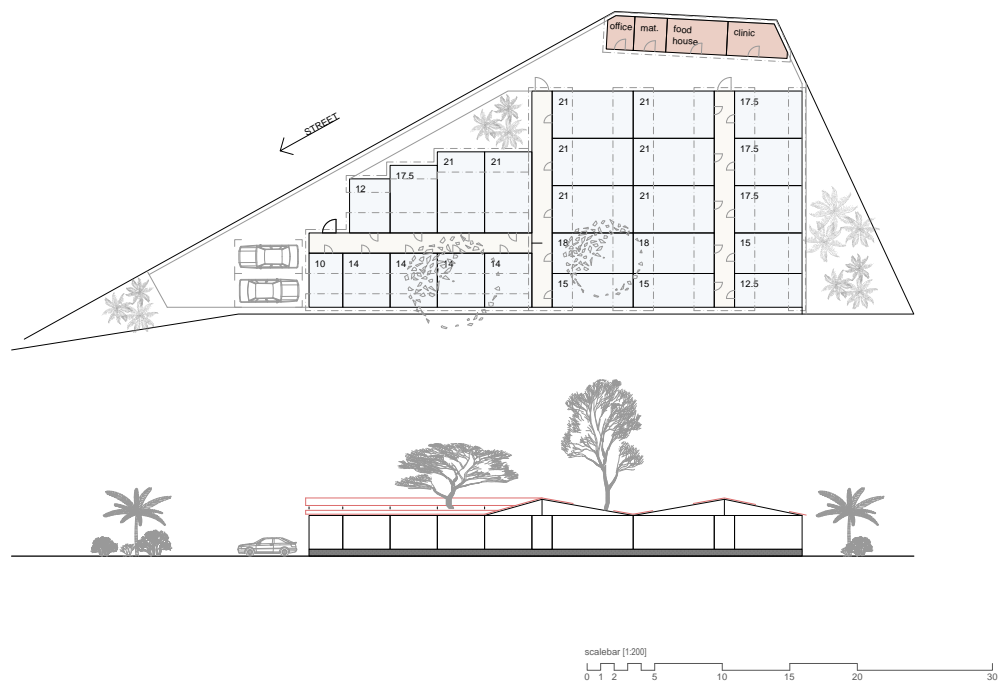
The new, 'adjusted' layout plan for the new facility, accommodating all 24 planned aviaries and additional supporting facilities.
